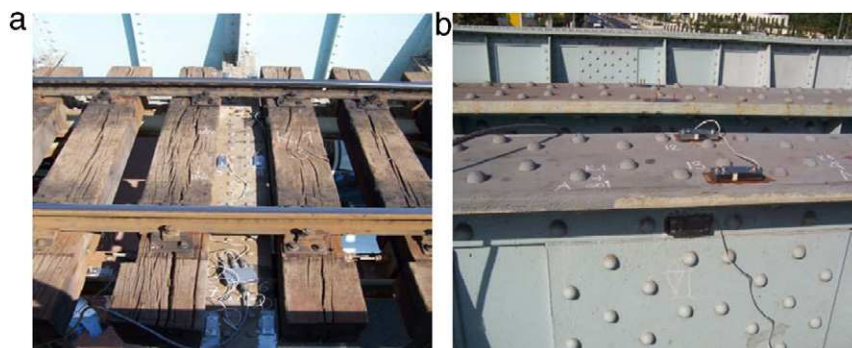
Strain transducers mounted on (a) stringers and cross beams (b) a main girder.
